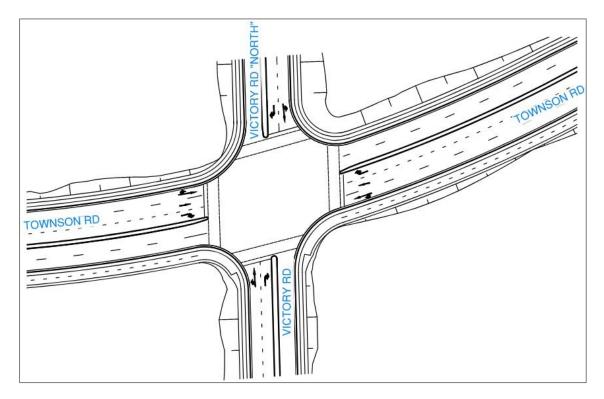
Plan view of the Victory Road intersection – ultimate phase layout
